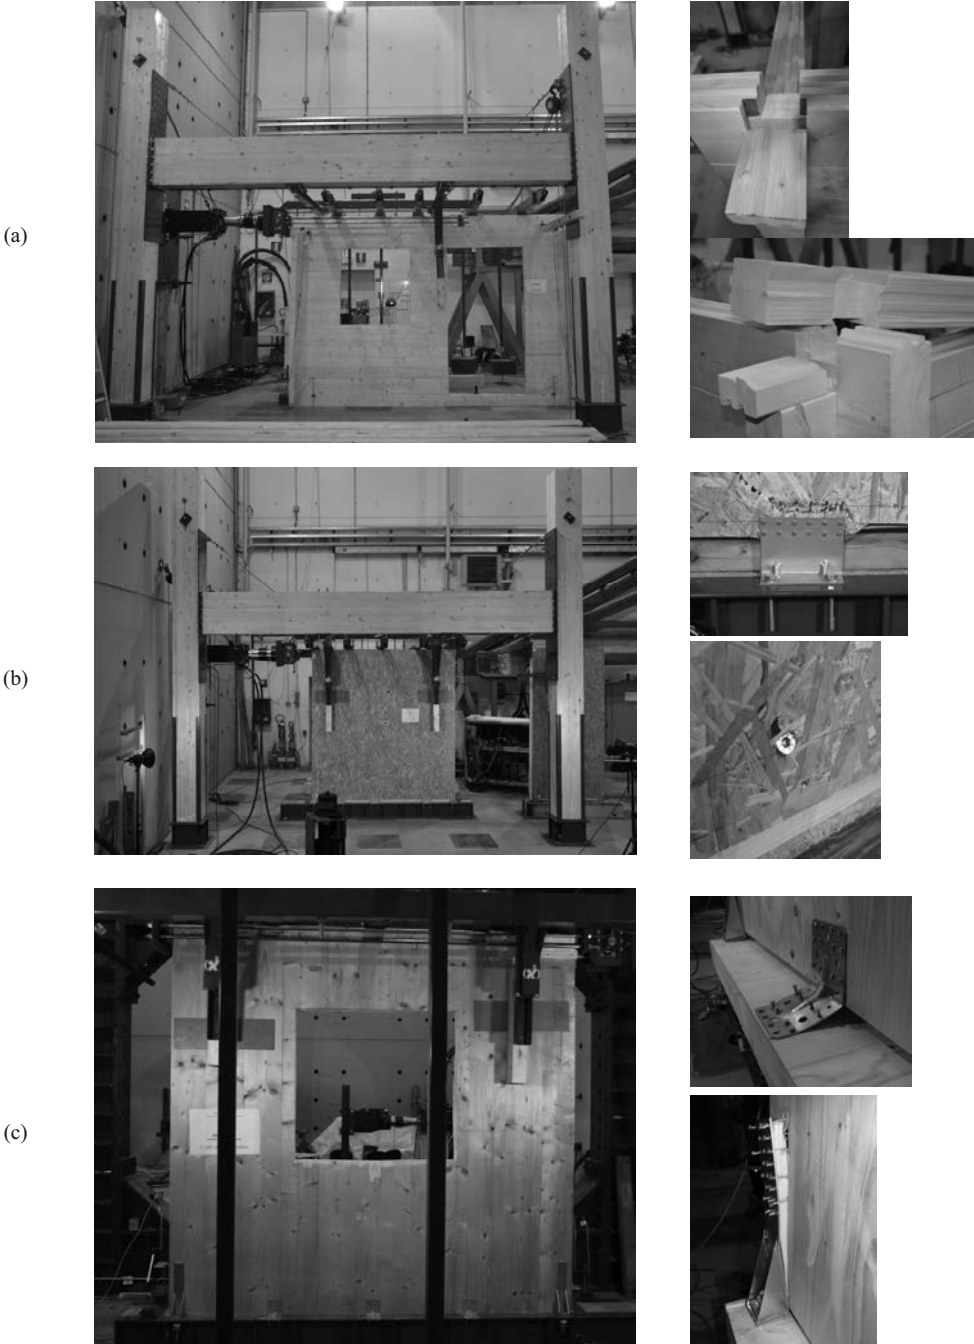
Test on log-house walls (a), timber frame walls (b) and cross laminated timber (CLT) walls.
